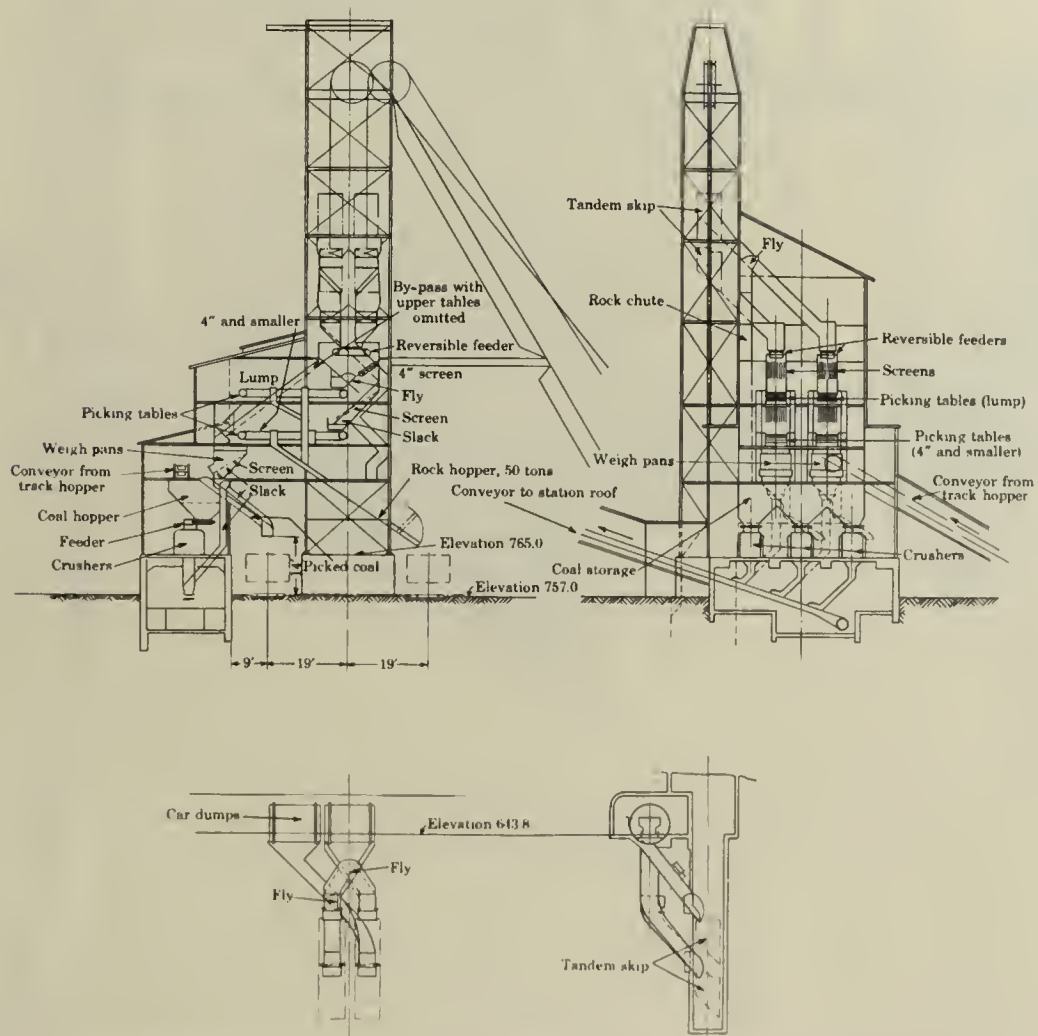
HEADFRAME AND TIPPLE AT SURFACE AND DUMP AND SKIP LOADING AT SHAFT BOTTOM
